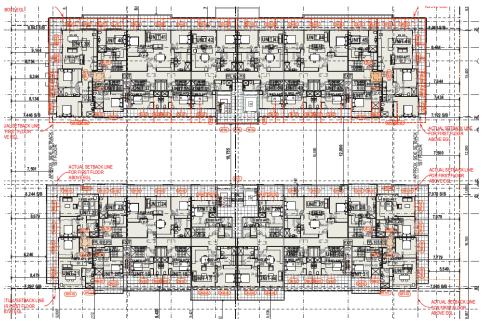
Propossed First Floor Plan (Source: Coble Stephens Architects)
